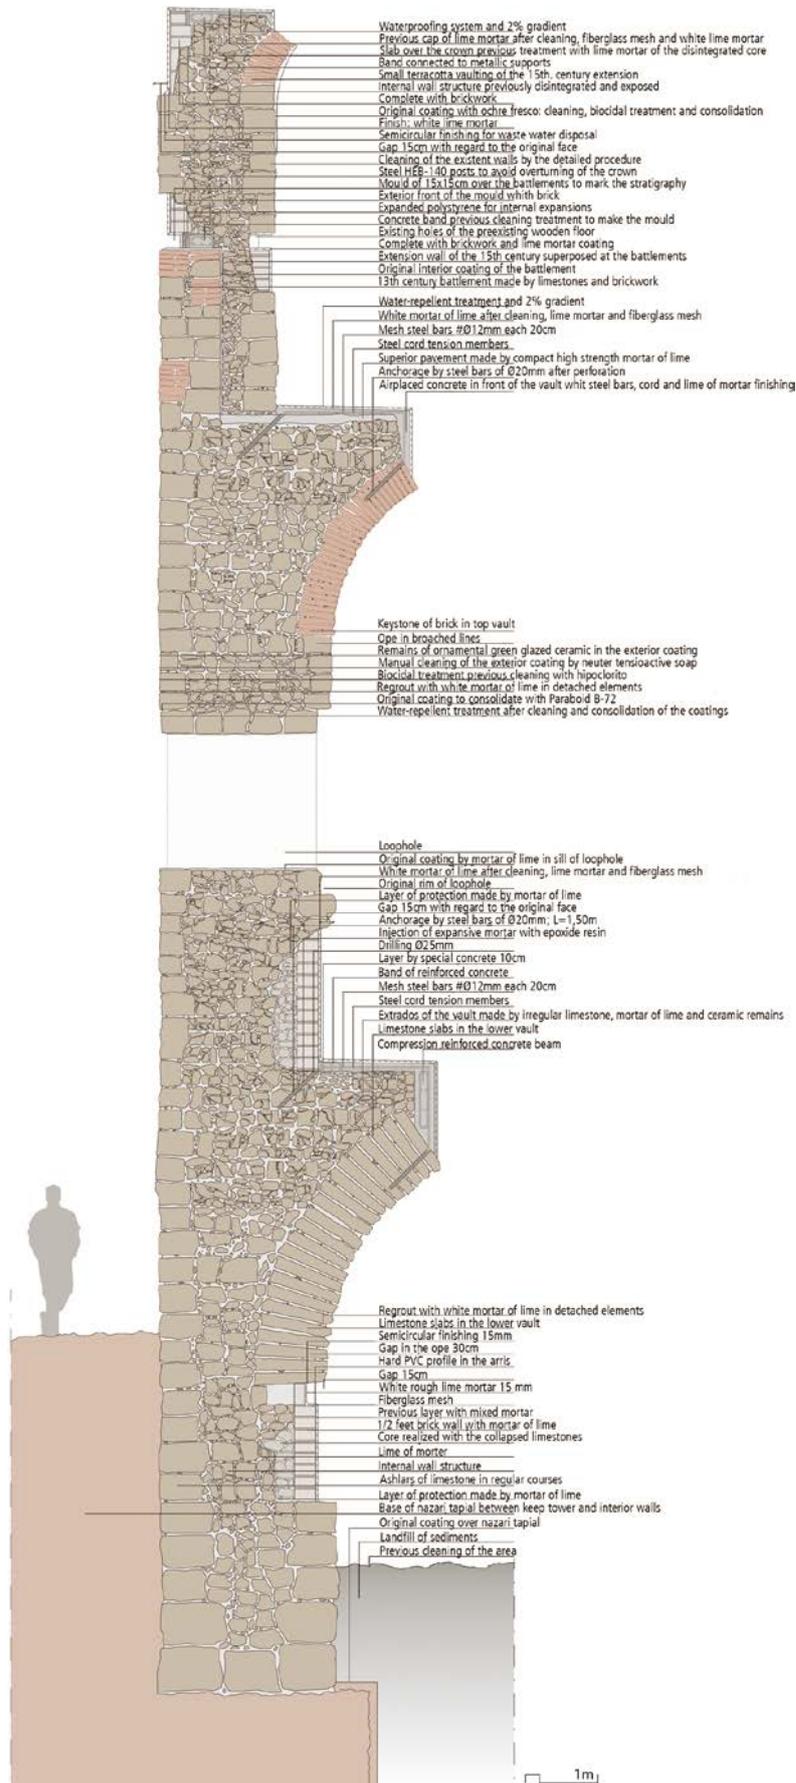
Longitudinal wall section detail (Source: Carquero Arquitectura, 2016a)
